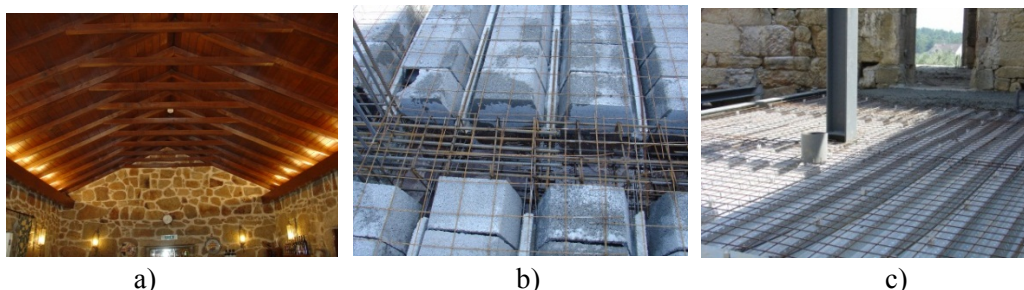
a) Wood flooring on wooden structure; b) T beam and block system slabs; c) Composite metal deck (steel decking for concrete floors slabs)
